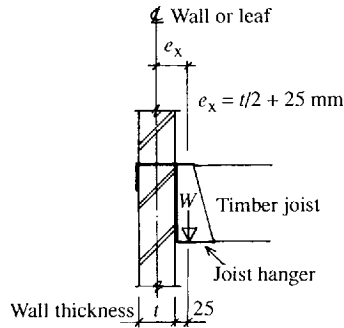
Assumed load eccentricity from a single floor or roof spanning on to a wall
